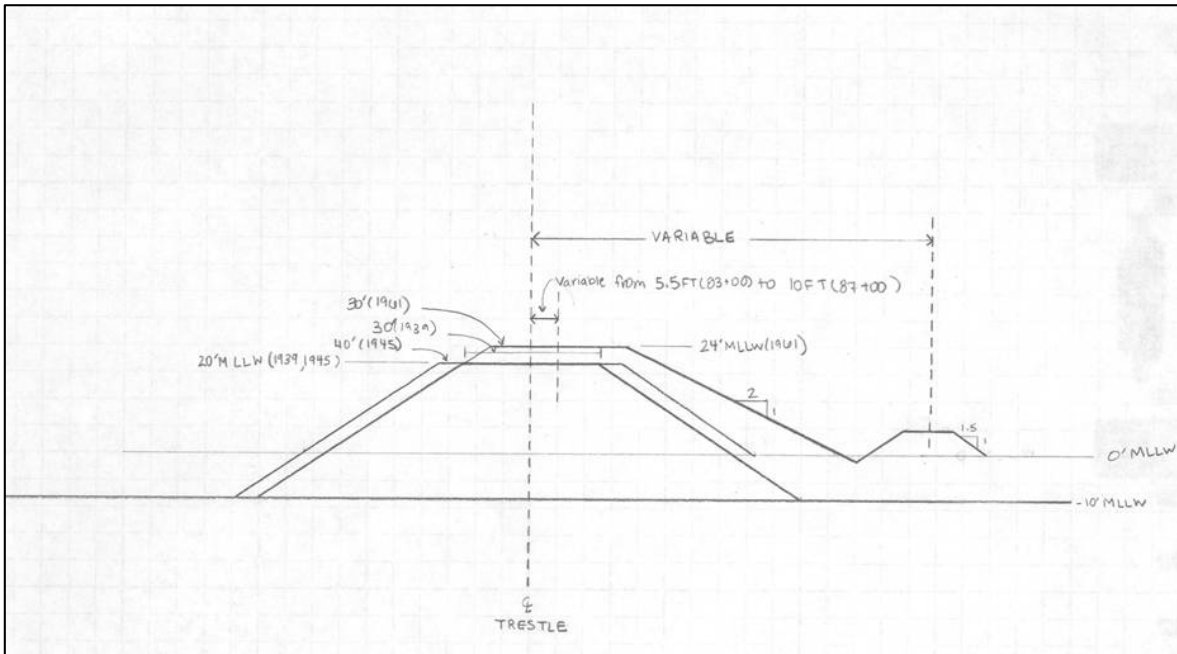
151. Jetty A Cross Section Templates - 79 to 90 - Trunk
